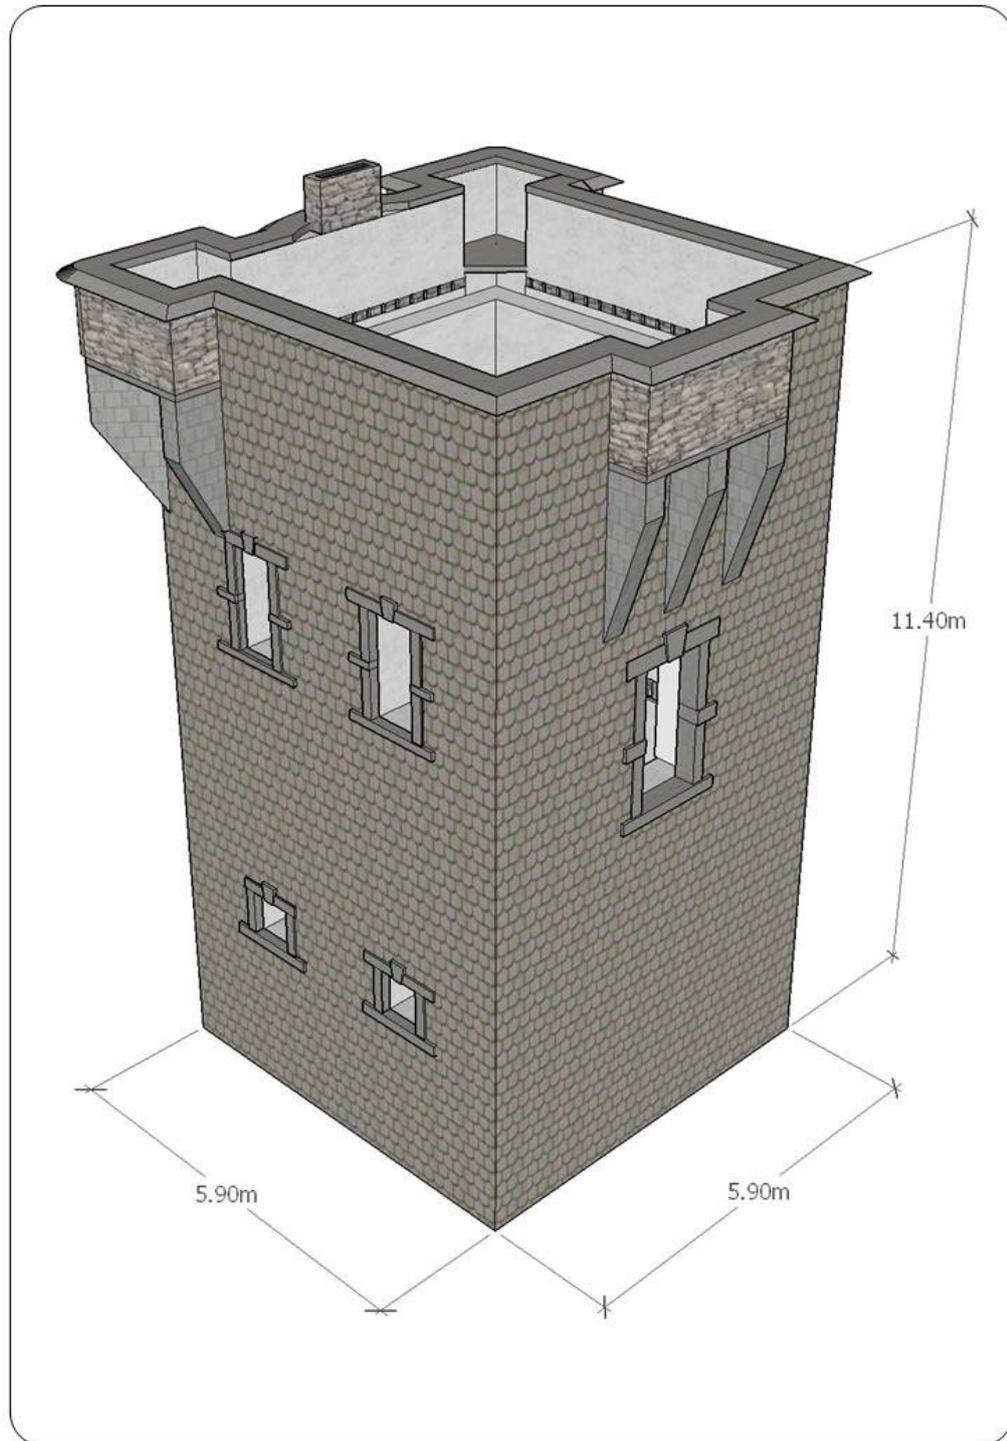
Oblique external view of rendered 3D model for an idealised signal tower showing front wall and side wall.
